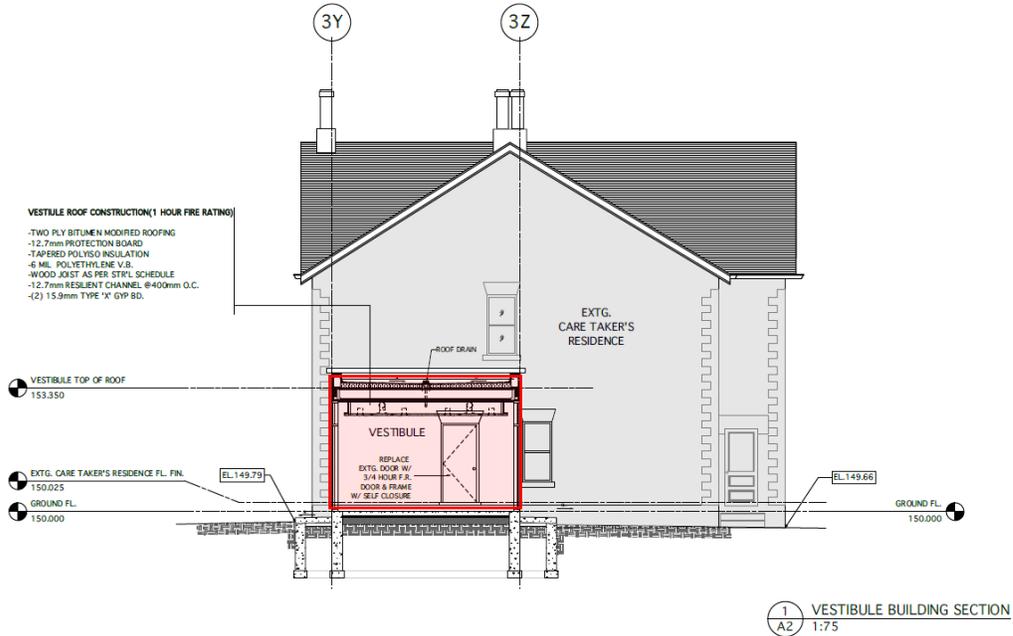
Proposed site plan (C.Y. Lee Architect Inc, 2019.) Architectural drawing of proposed development; existing care taker's residence represents the heritage building; red box indicates vestibule between new addition and heritage building (C.Y. Lee Architect Inc., 2019)
